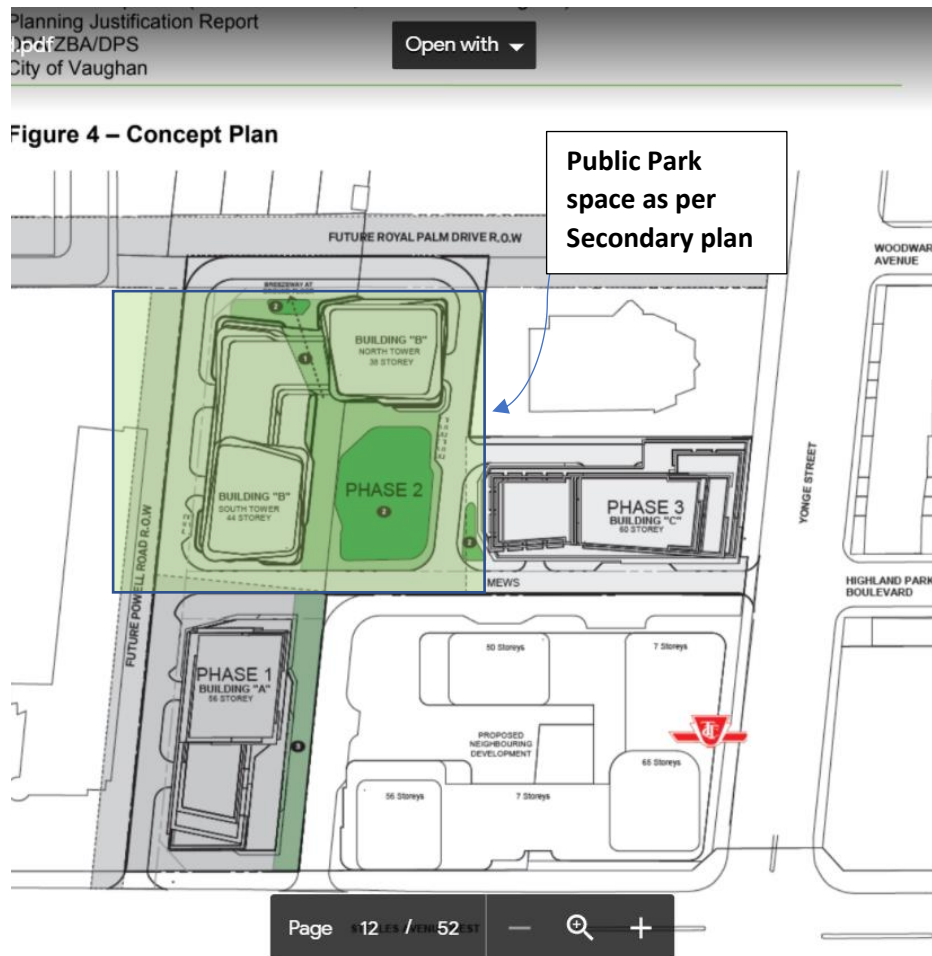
Concept Plan (Architectural Drawings, p. 12) superimposed on Schedule 2 of Secondary Plan green space location
